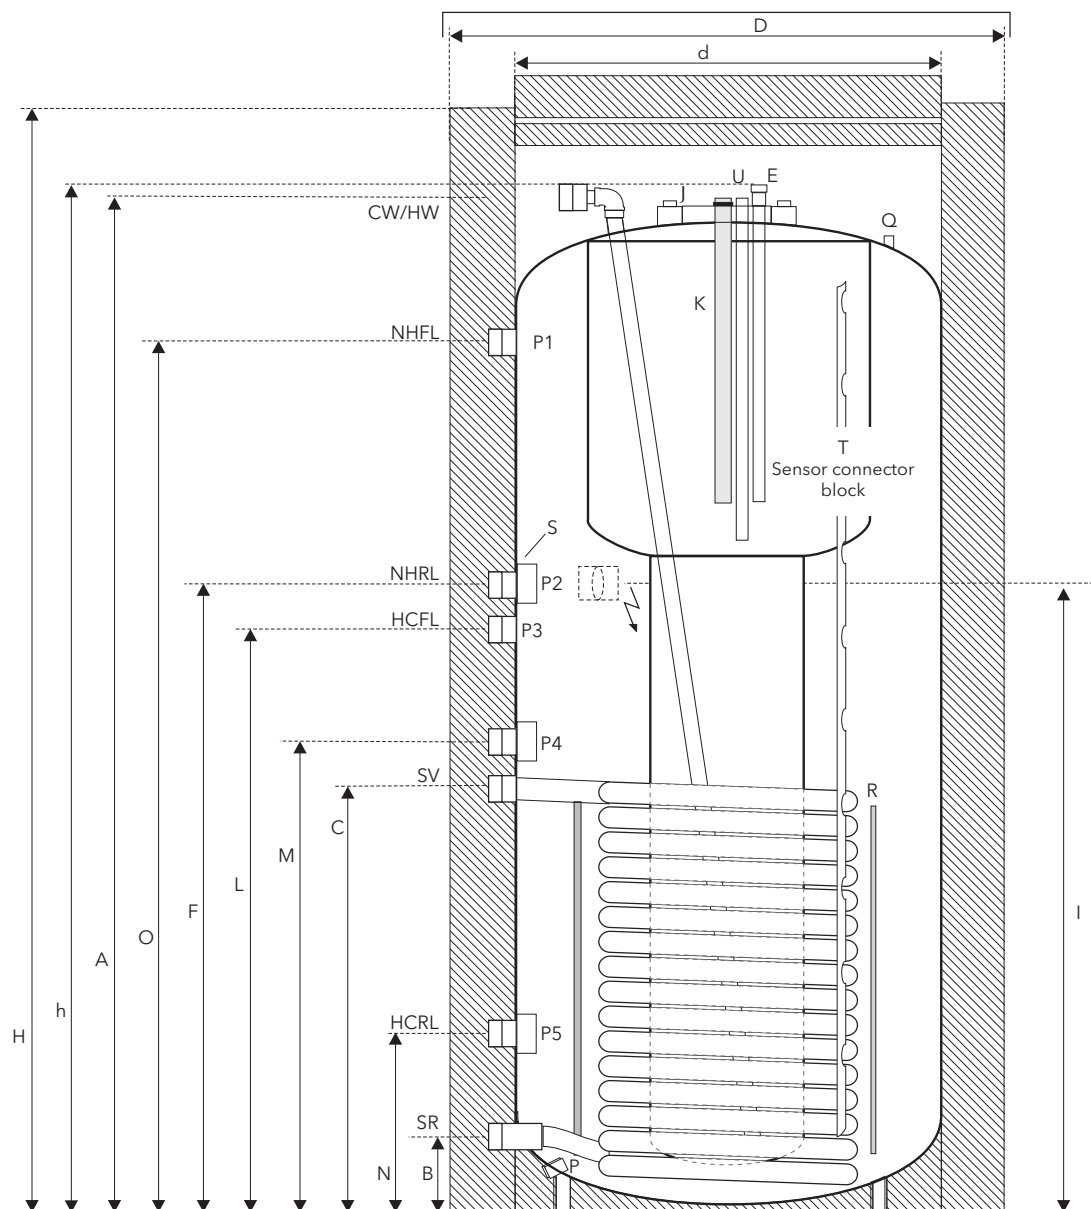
Cross-sectional view of the TERMO combi cylinder with dimensions marked.
